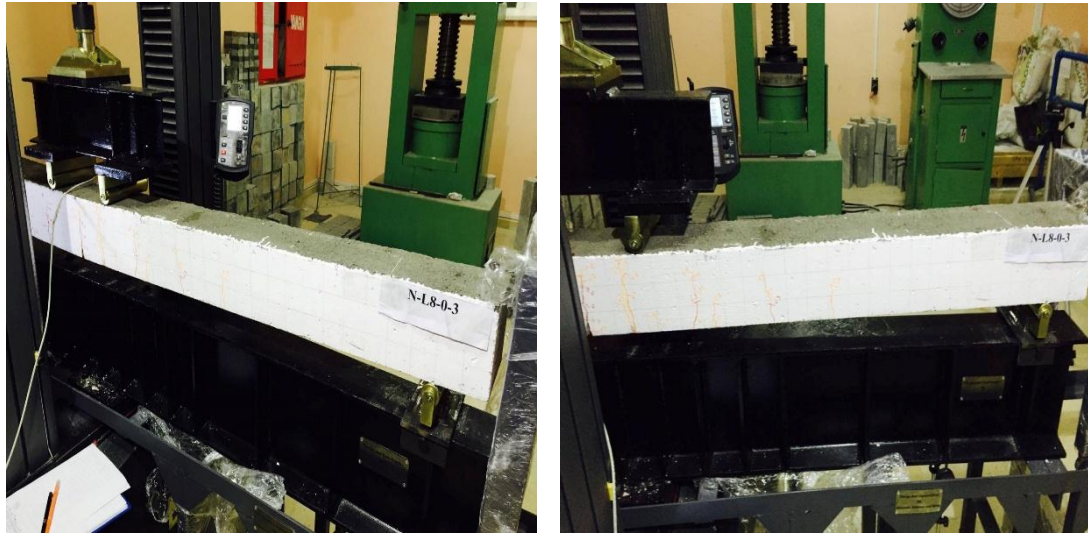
Crack pattern for beam specimen N-L8-0-3.
